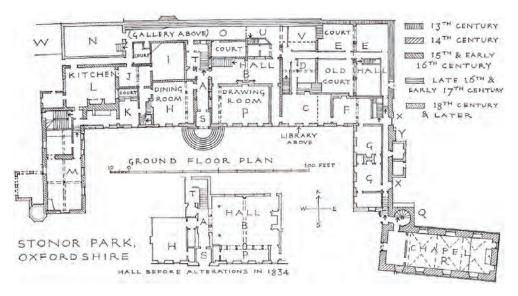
Ground floor plan (taken from VCH Oxon. 8, p. 144).
